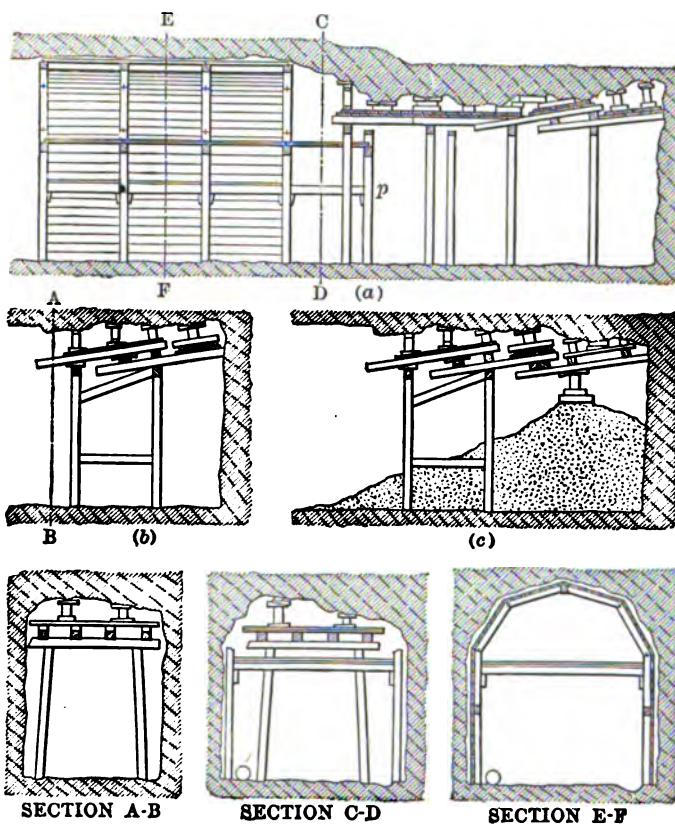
System of timbering at Elizabeth Lake tunnel.
